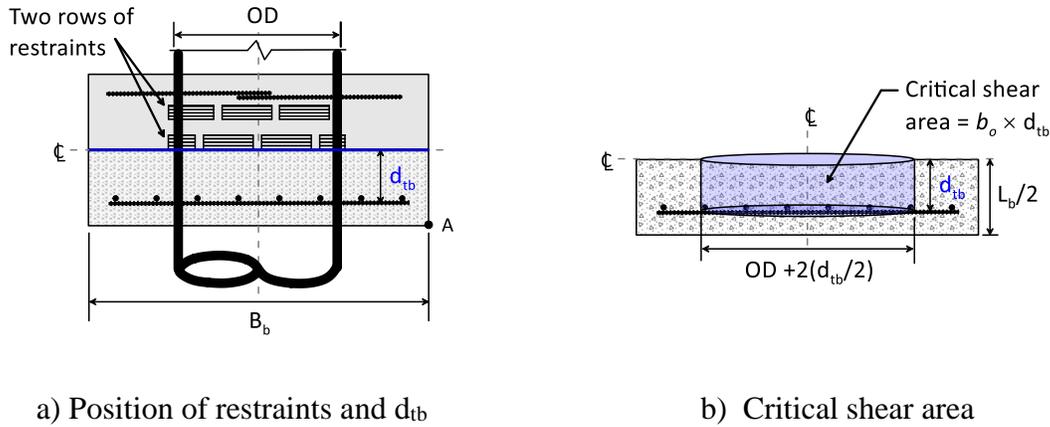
Cross-section showing two rows of restraints for 24-in. pipe example
